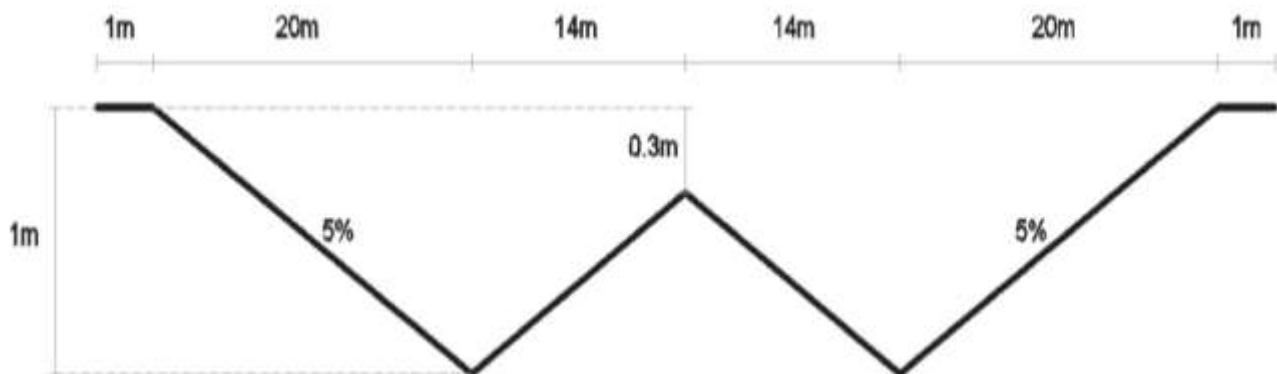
Cross Section through proposed Waste Disposal Facility 5 Floor
